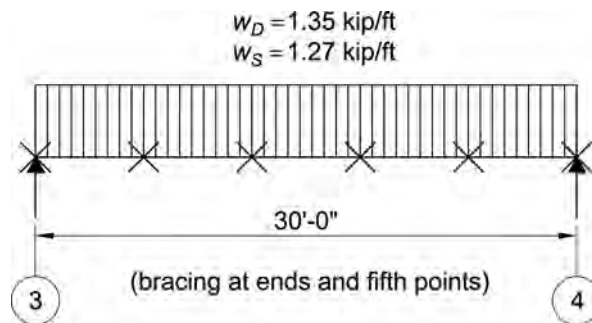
Loading and bracing diagram for roof beams from grid 3 to 4, 4 to 5, and 5 to 6.
